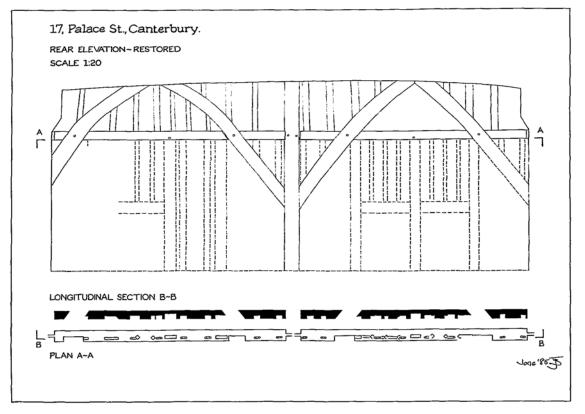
17 Palace Street, Canterbury: Elevation of rear Wall.
